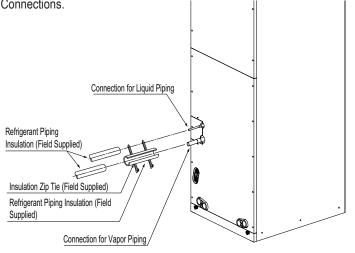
Insulating the Refrigerant Piping and Refrigerant Piping Connections.
